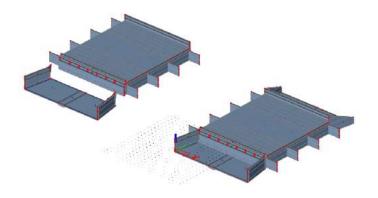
The structure such as it is drawn in SCIA Engineer. On the left, the outlet slab and walls are shown separately from the floodgate. On the right, the structure is shown as with all element attached to each other.
